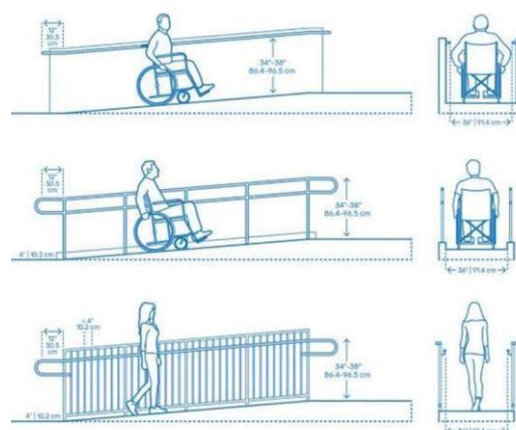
The means of transportation for building a ramp (source: <https://www.arsitur.com/2017/12/perancangan-ramp-pada-building.html> 2021)
